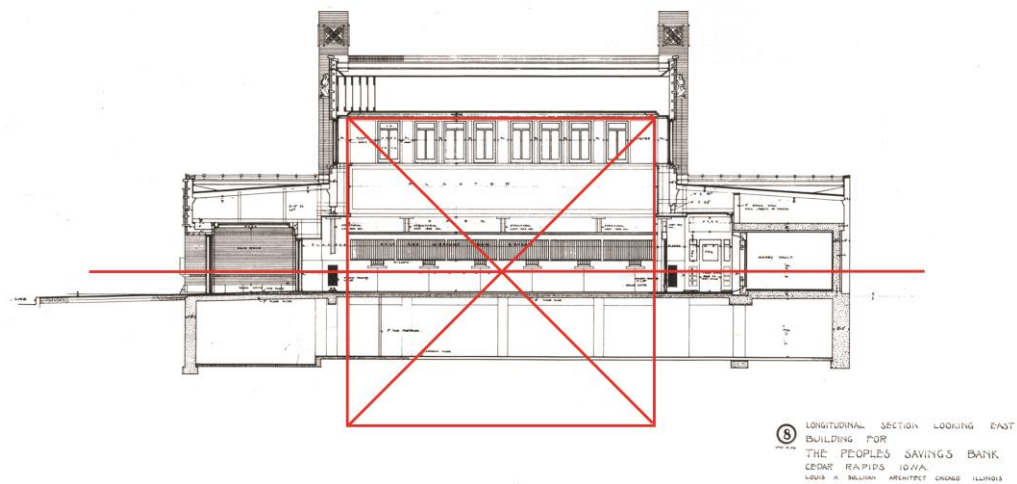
Section through Peoples Savings Bank, Showing Square Geometry Bound by Inner Faces of Piers and Ceiling, and Center Falling on the “Deal Plate” or Place of Exchange with the Bank Tellers
